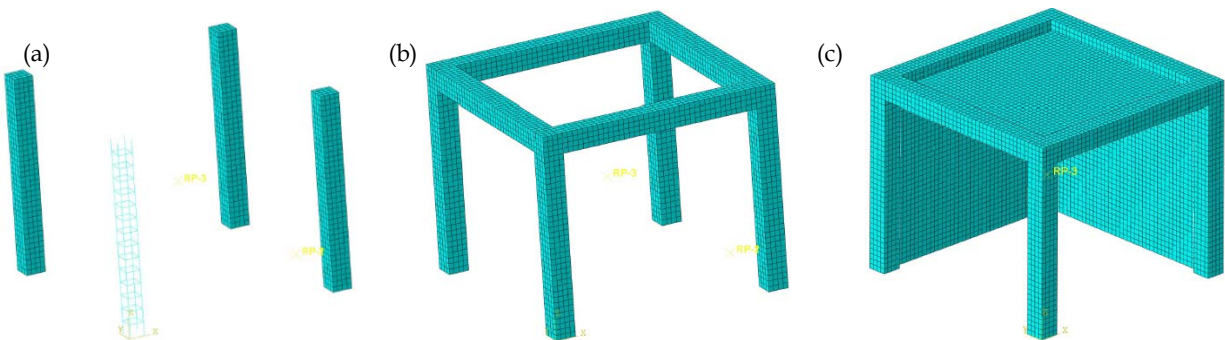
Building (a) columns with reinforcement (b) concrete frame and (c) frame with walls and roof slab
